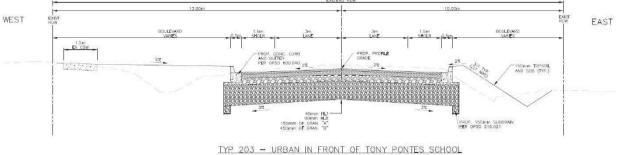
Typical Section – In Front of Tony Pontes School
